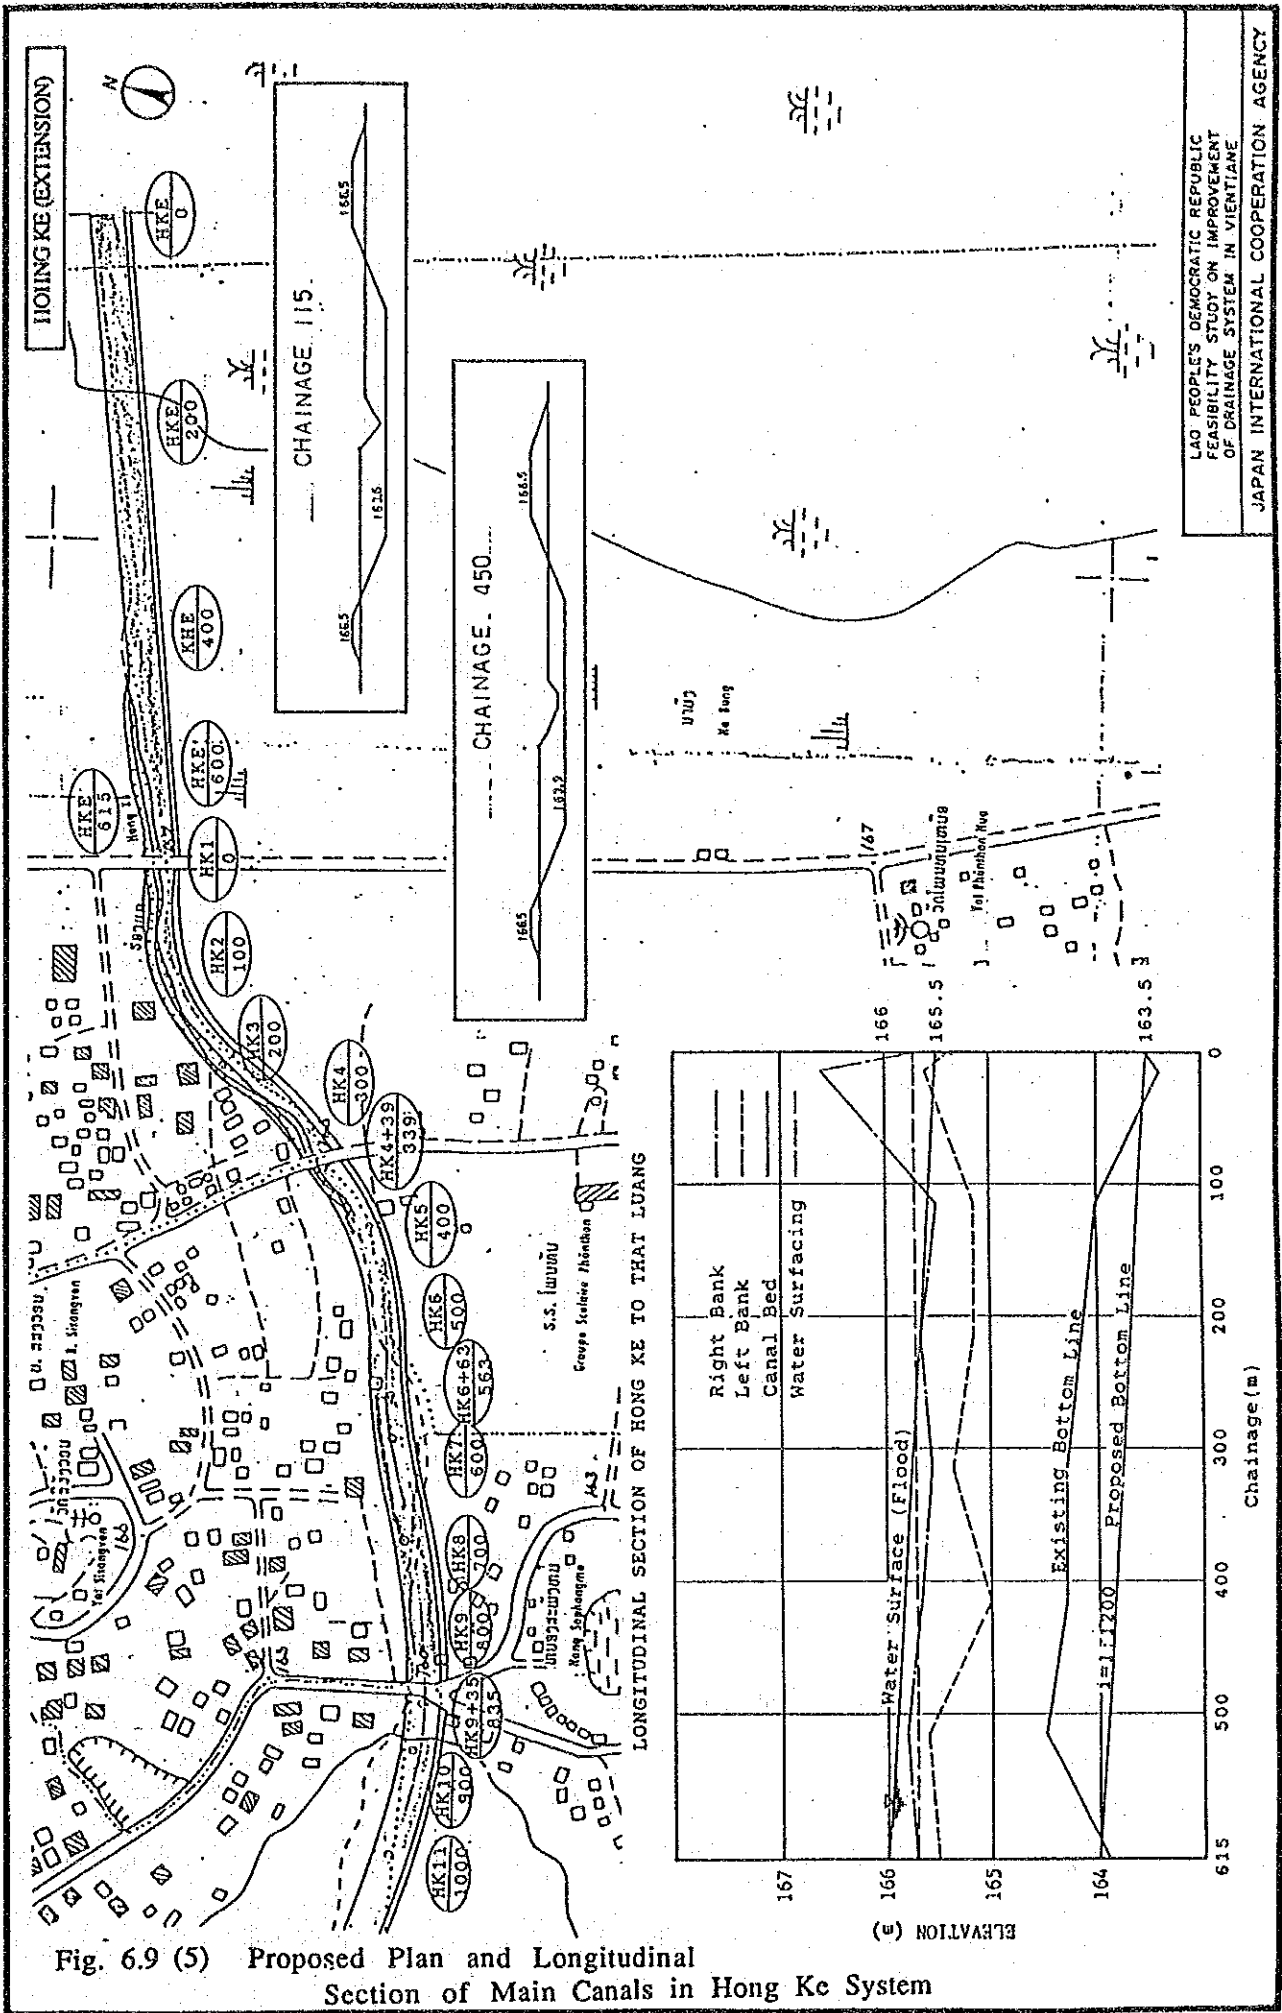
(5) Proposed Plan and Longitudinal Section of Main Canals in Hong Ke System
